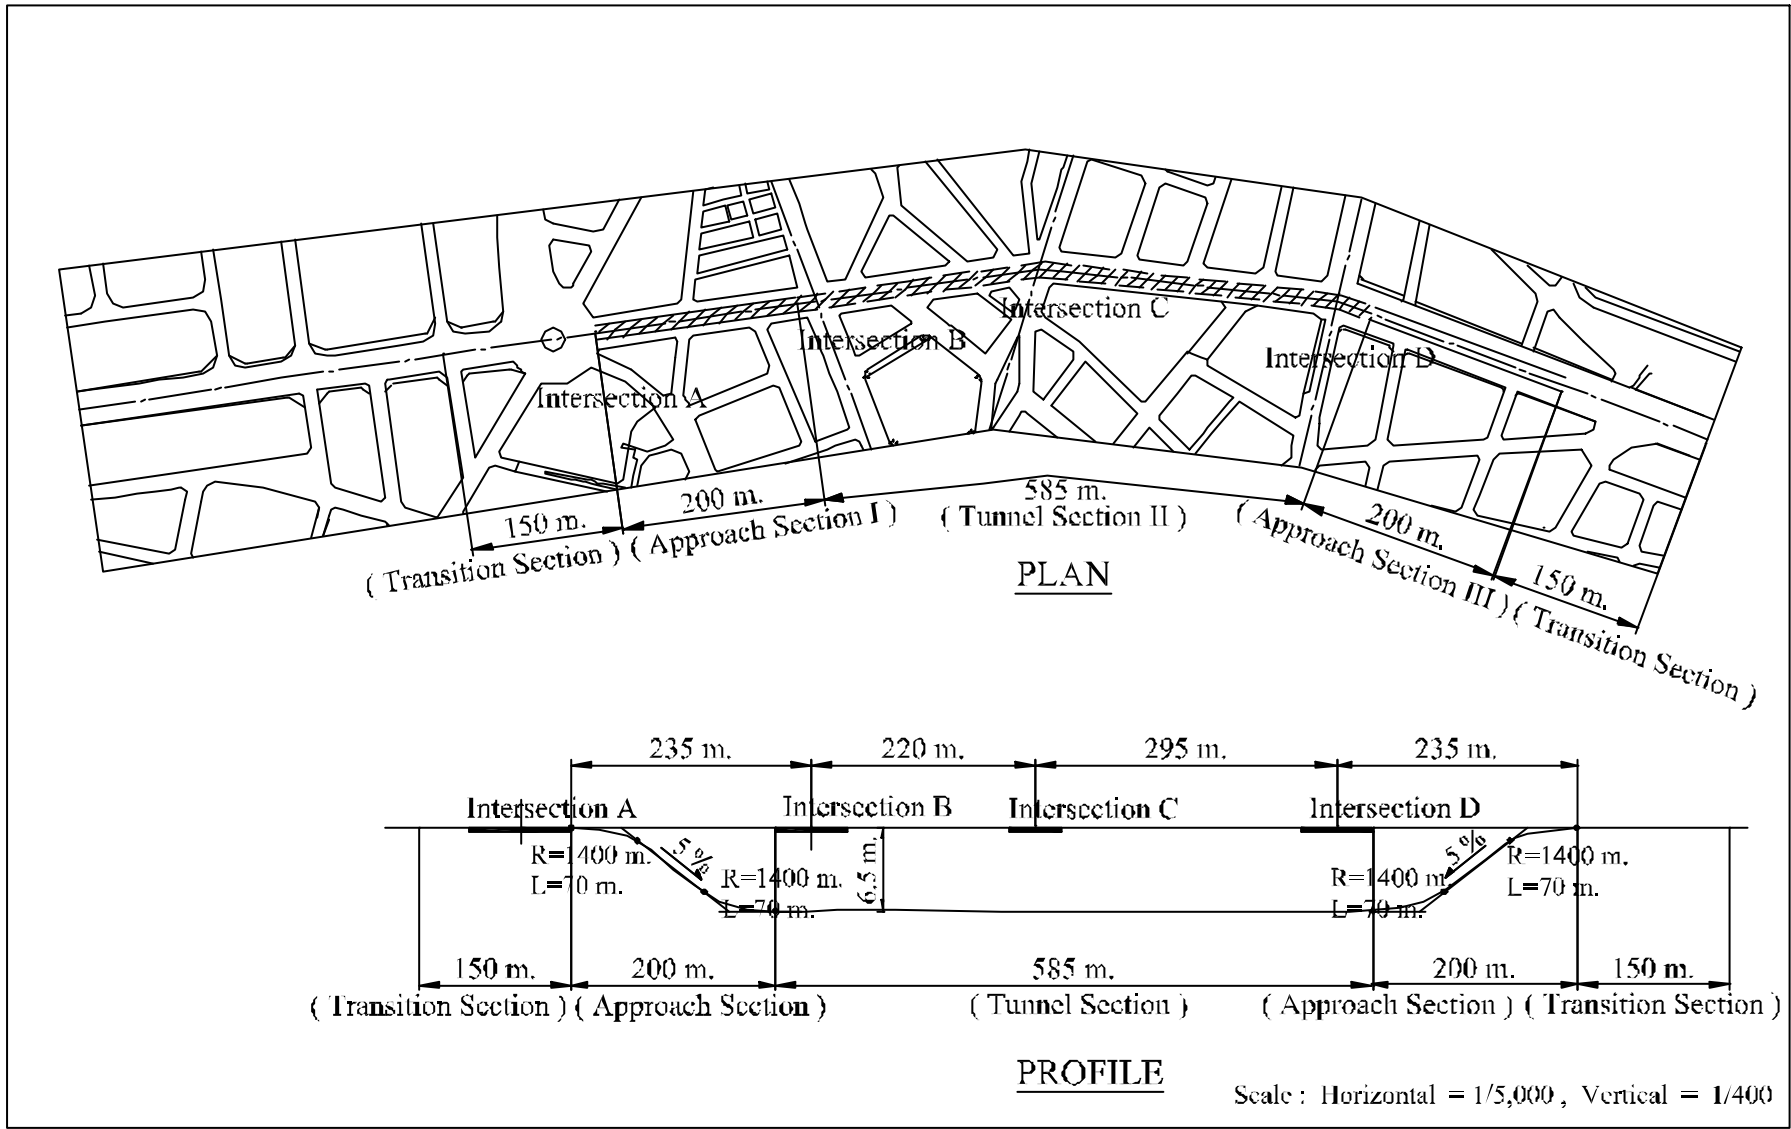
Tripoli Boulevard Underpass: Plan And Profile
